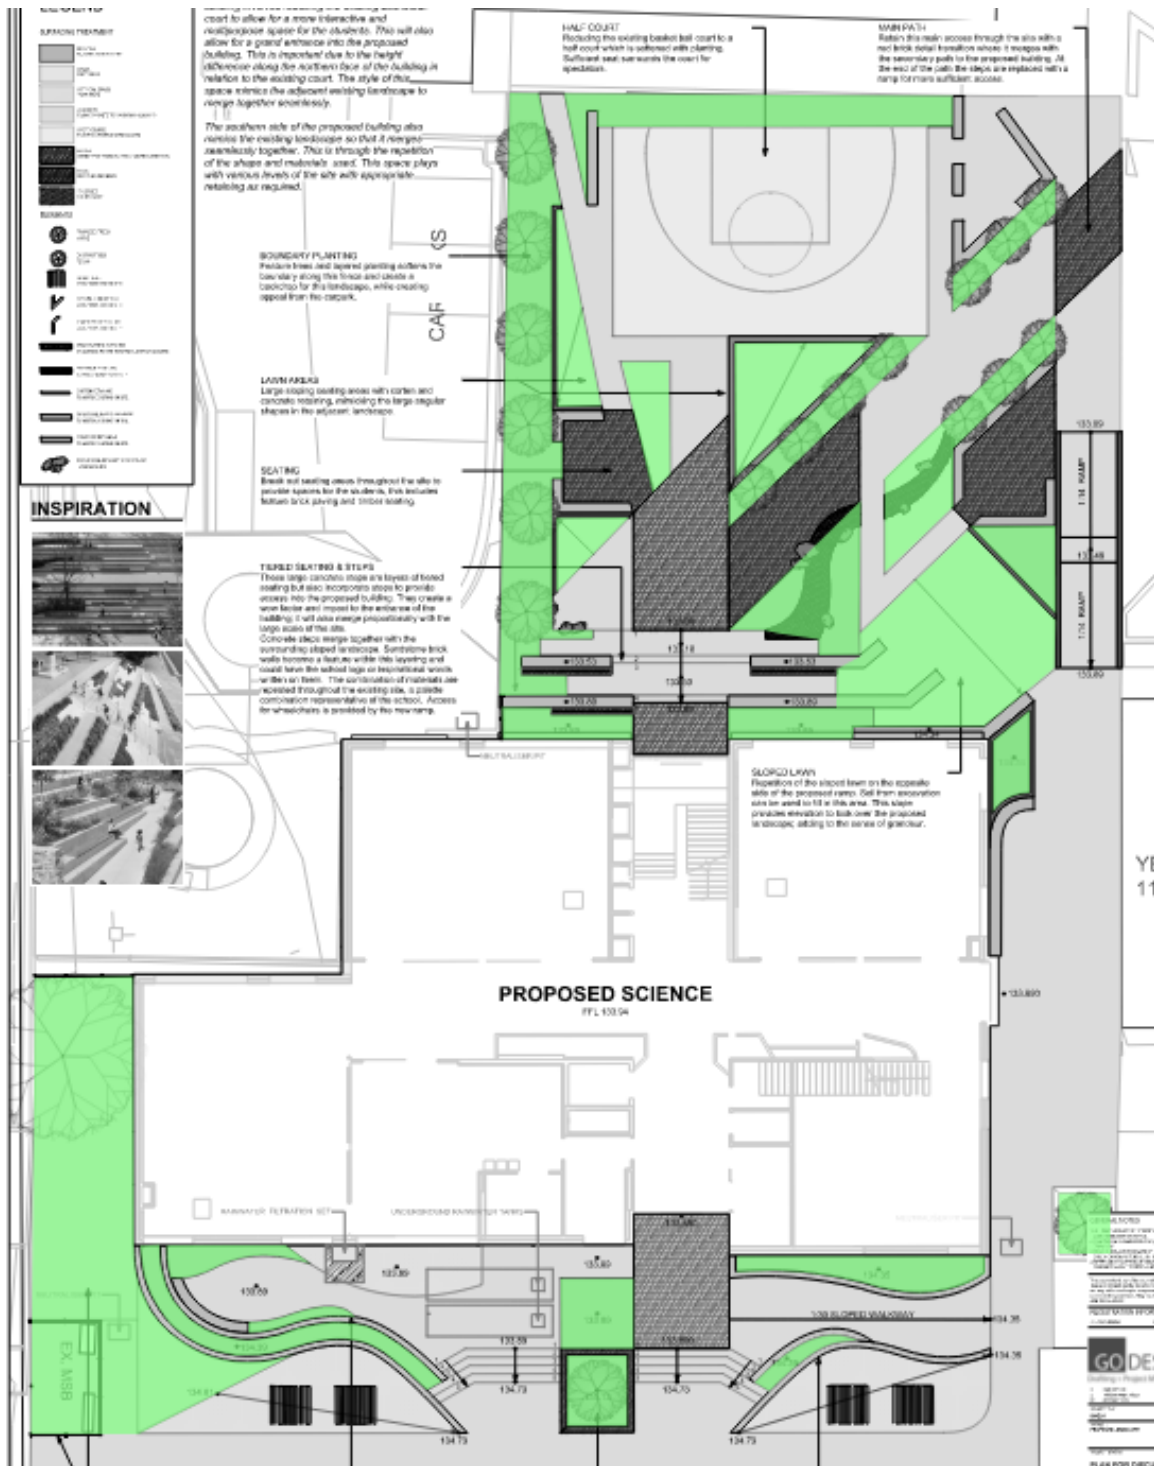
Site plan mark-up showing proposed planted areas on ground floor
